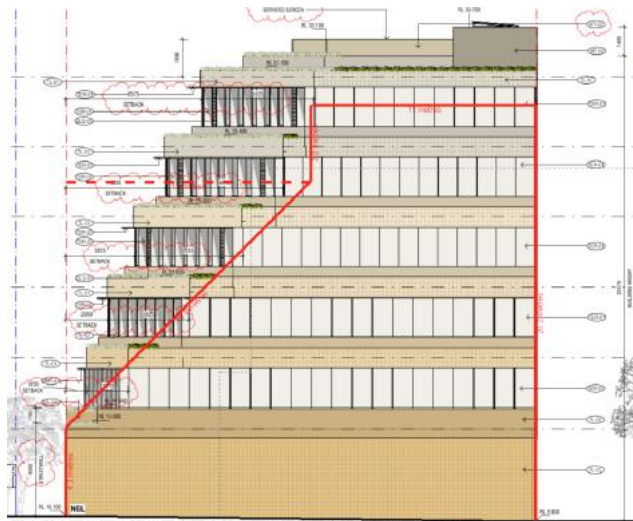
Proposed north elevation with Draft UDF preferred upper-level setback envelope outlined in red
